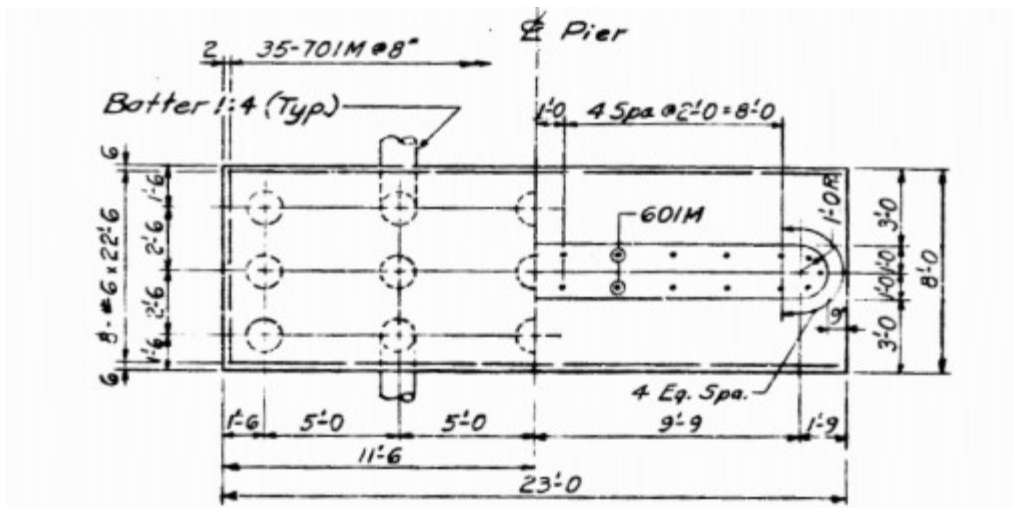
System C: Cross Section of Typical Interior Pier of the Bridge (NBI 33420) (1986)
